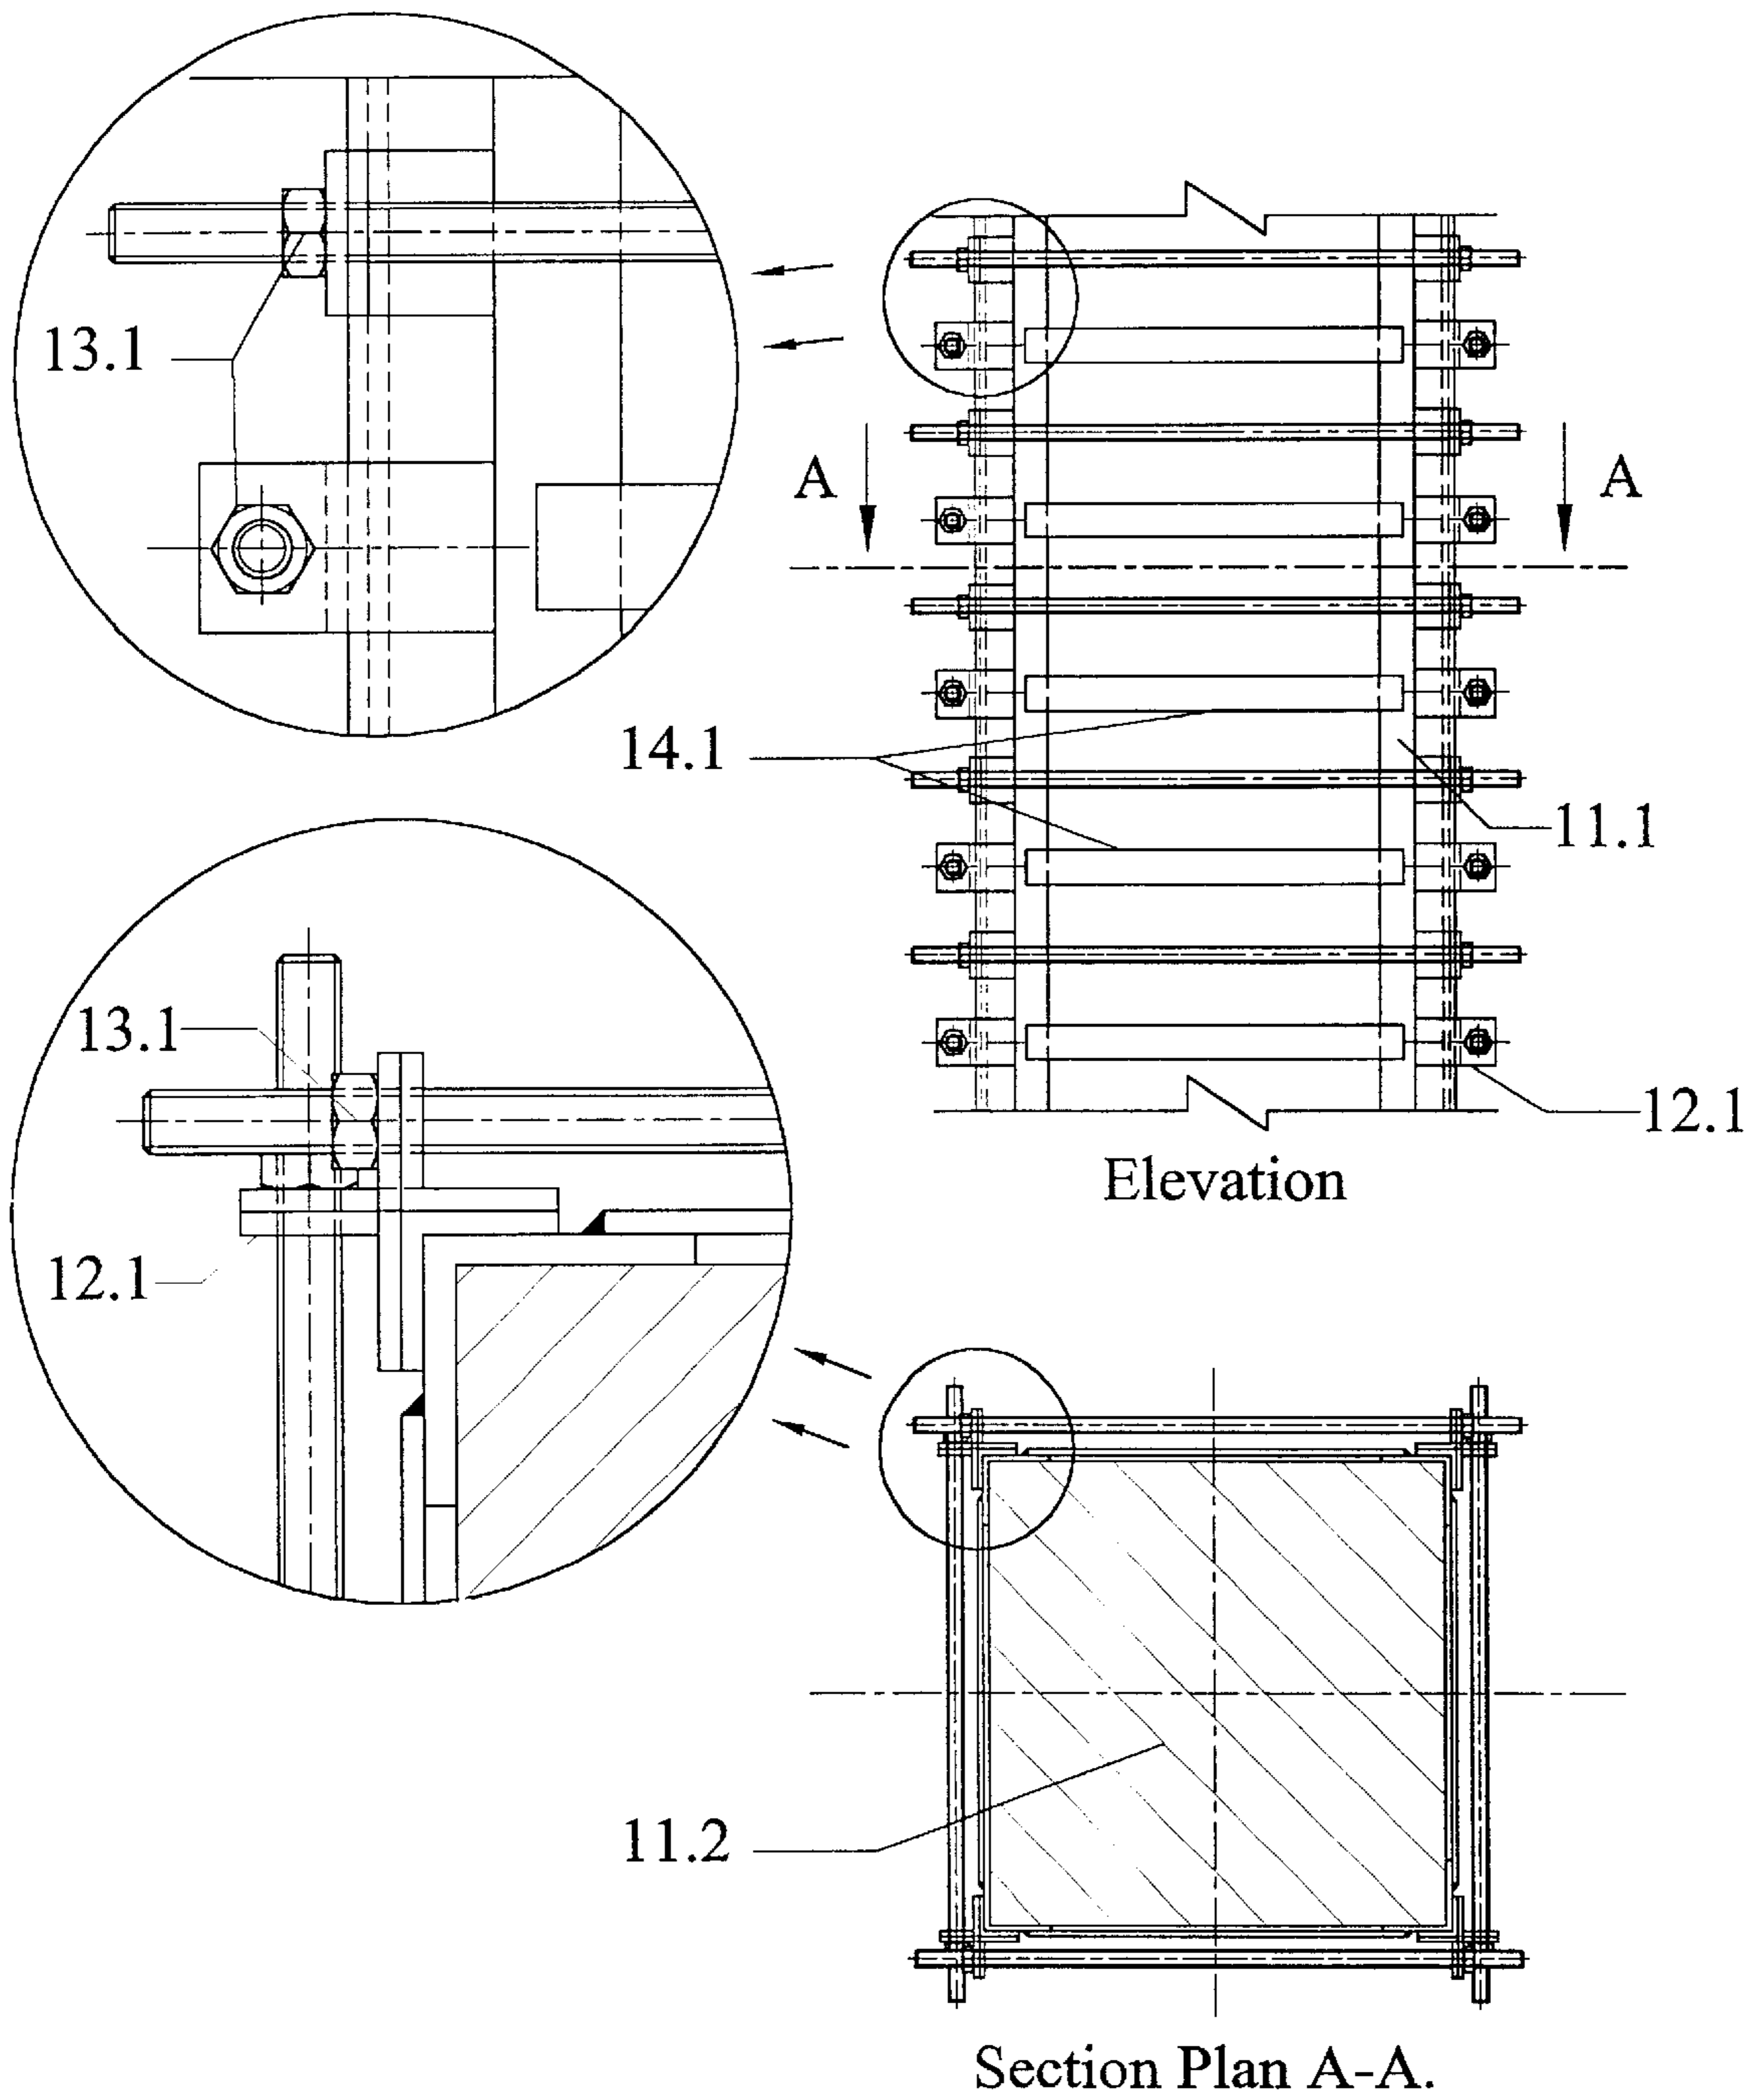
An Elevation and Section of a Column After Applying the confining pressure and before untied the Pressure Casing 1
